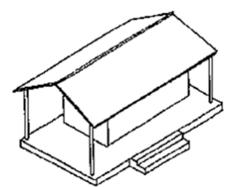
Low building with wide overhanging roof Climate Responsive Building - Appropriate Building Construction in Tropical and Subtropical Regions (SKAT; 1993; 324 pages)
